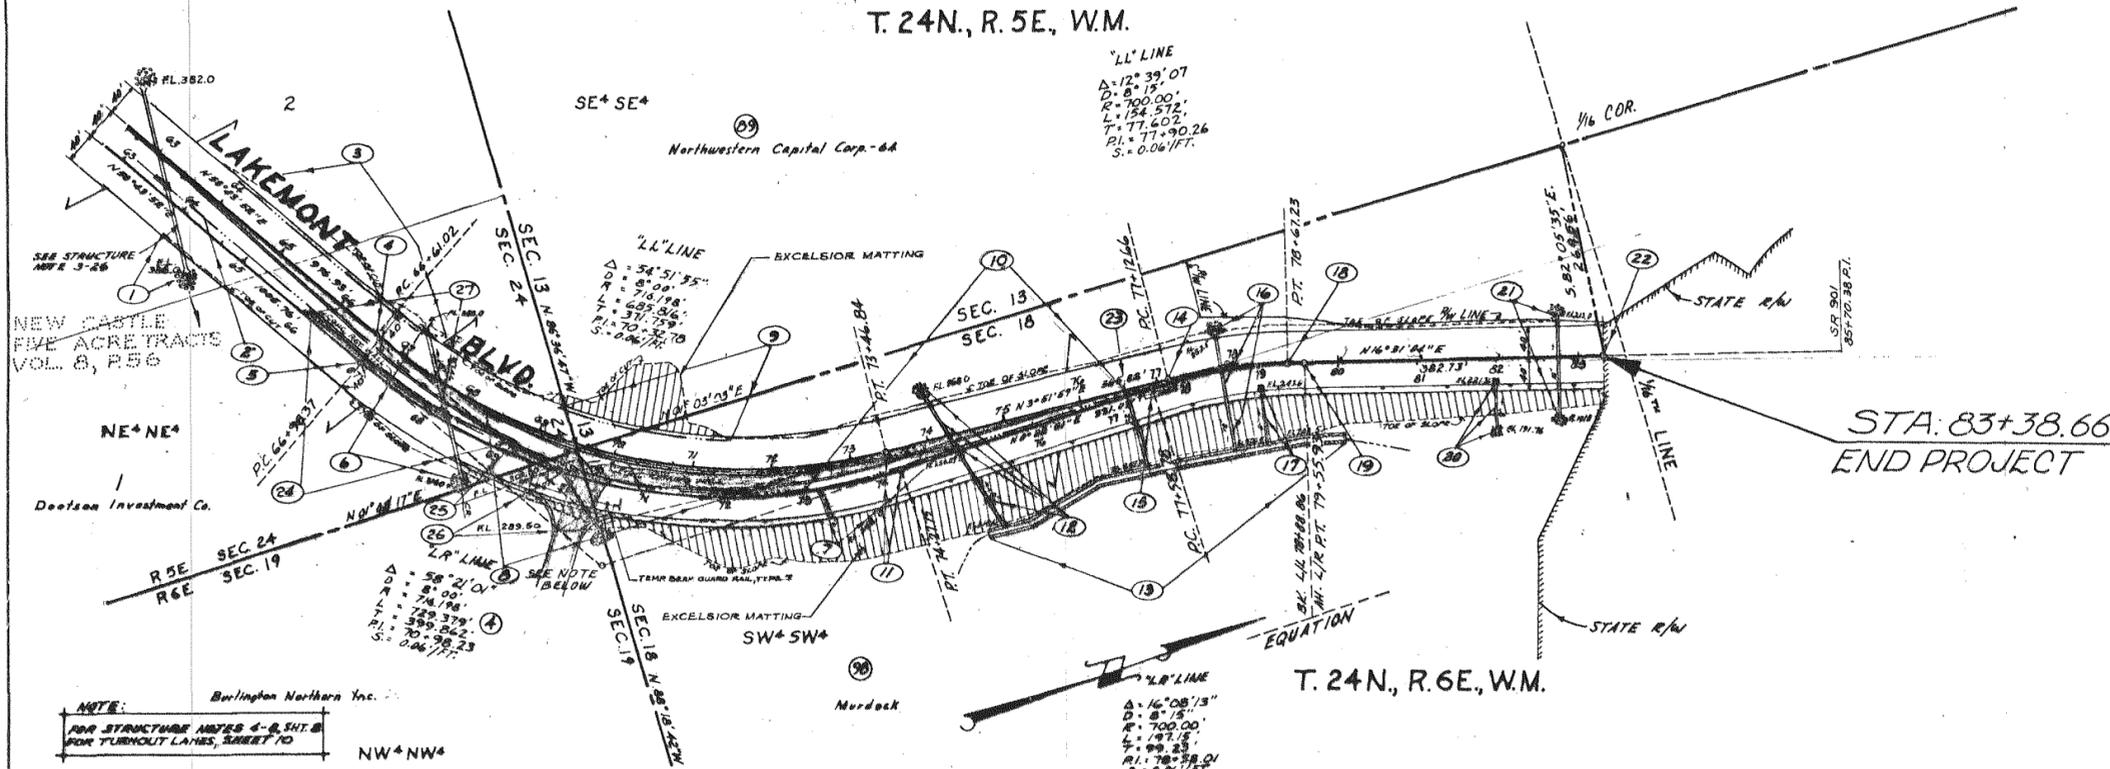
PLAN - PROFILE & P.P.R. STANDARD
